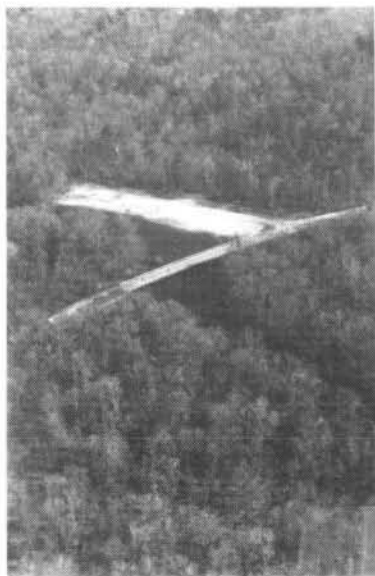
S. C. SECONDARY 55 HIGHWAY BRIDGE (R.M. 50.6)
